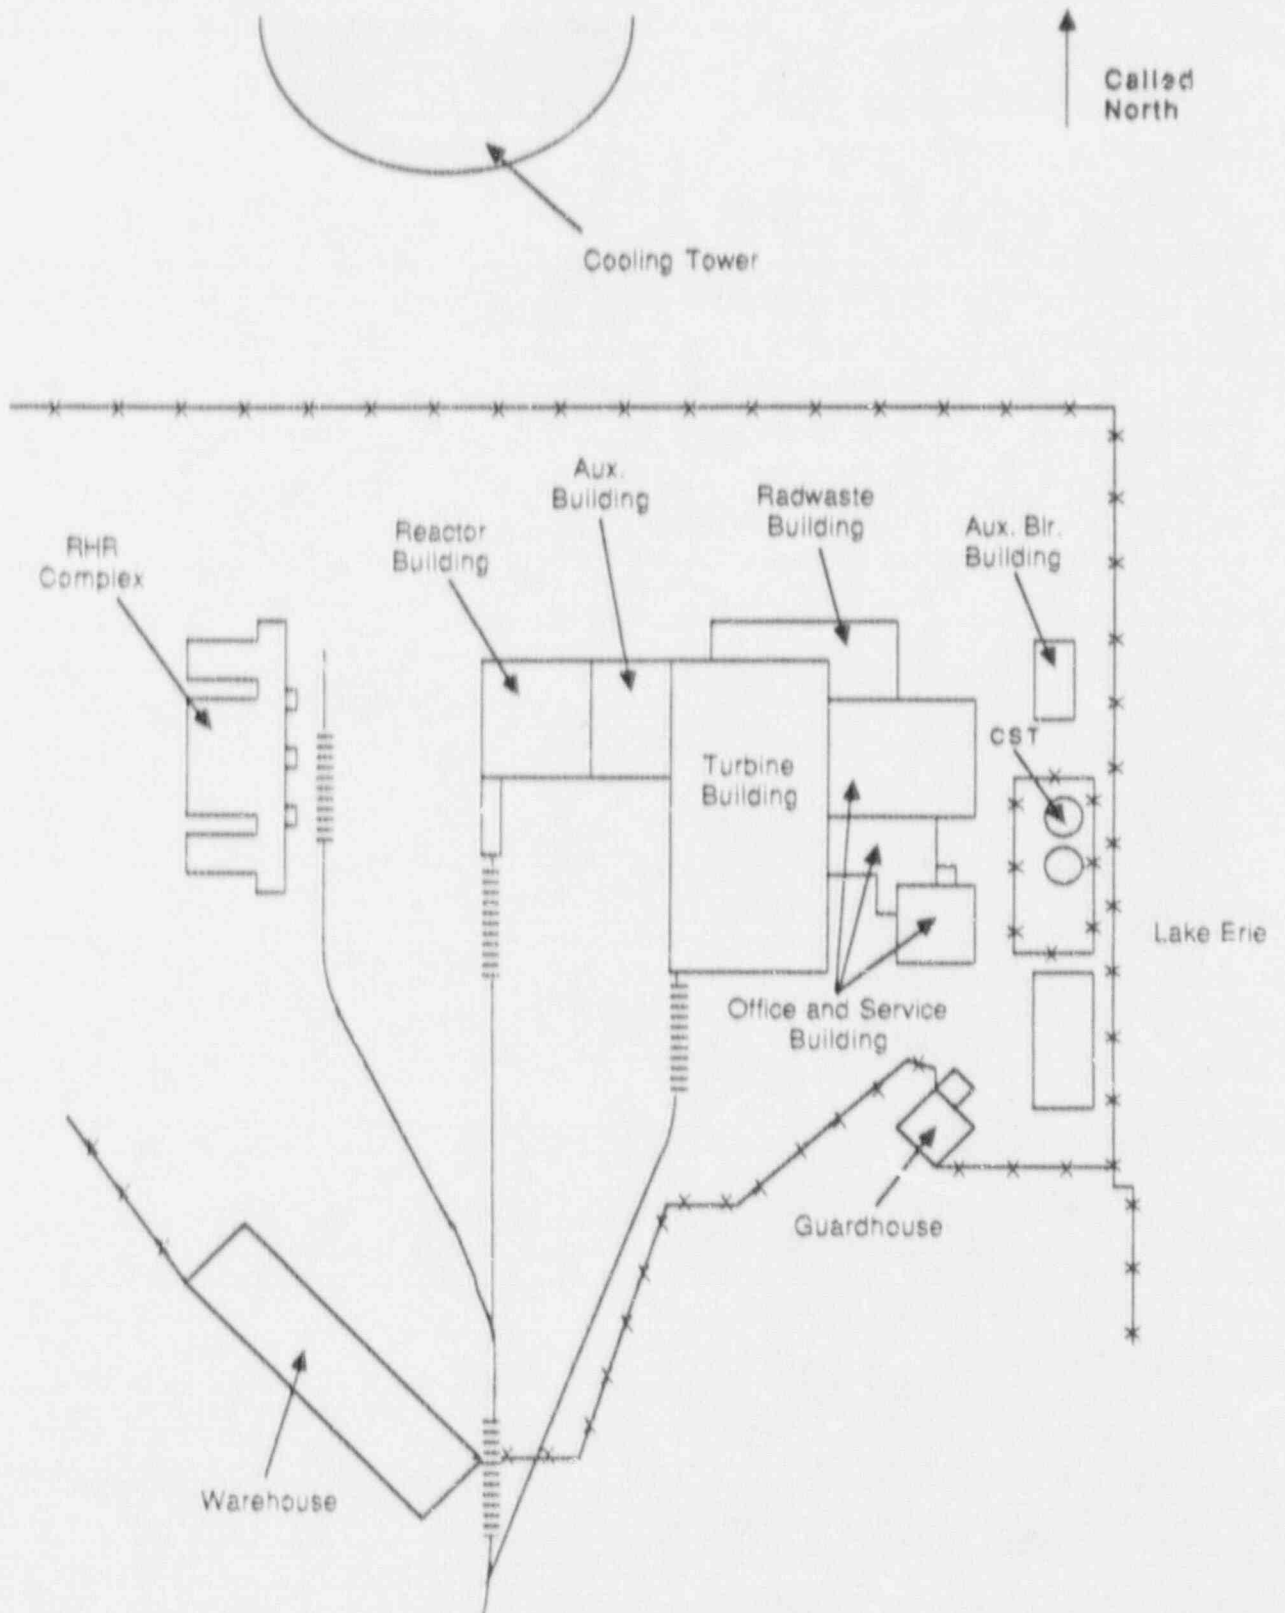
General Arrangement of Major Buildings at the Fermi 2 Site
